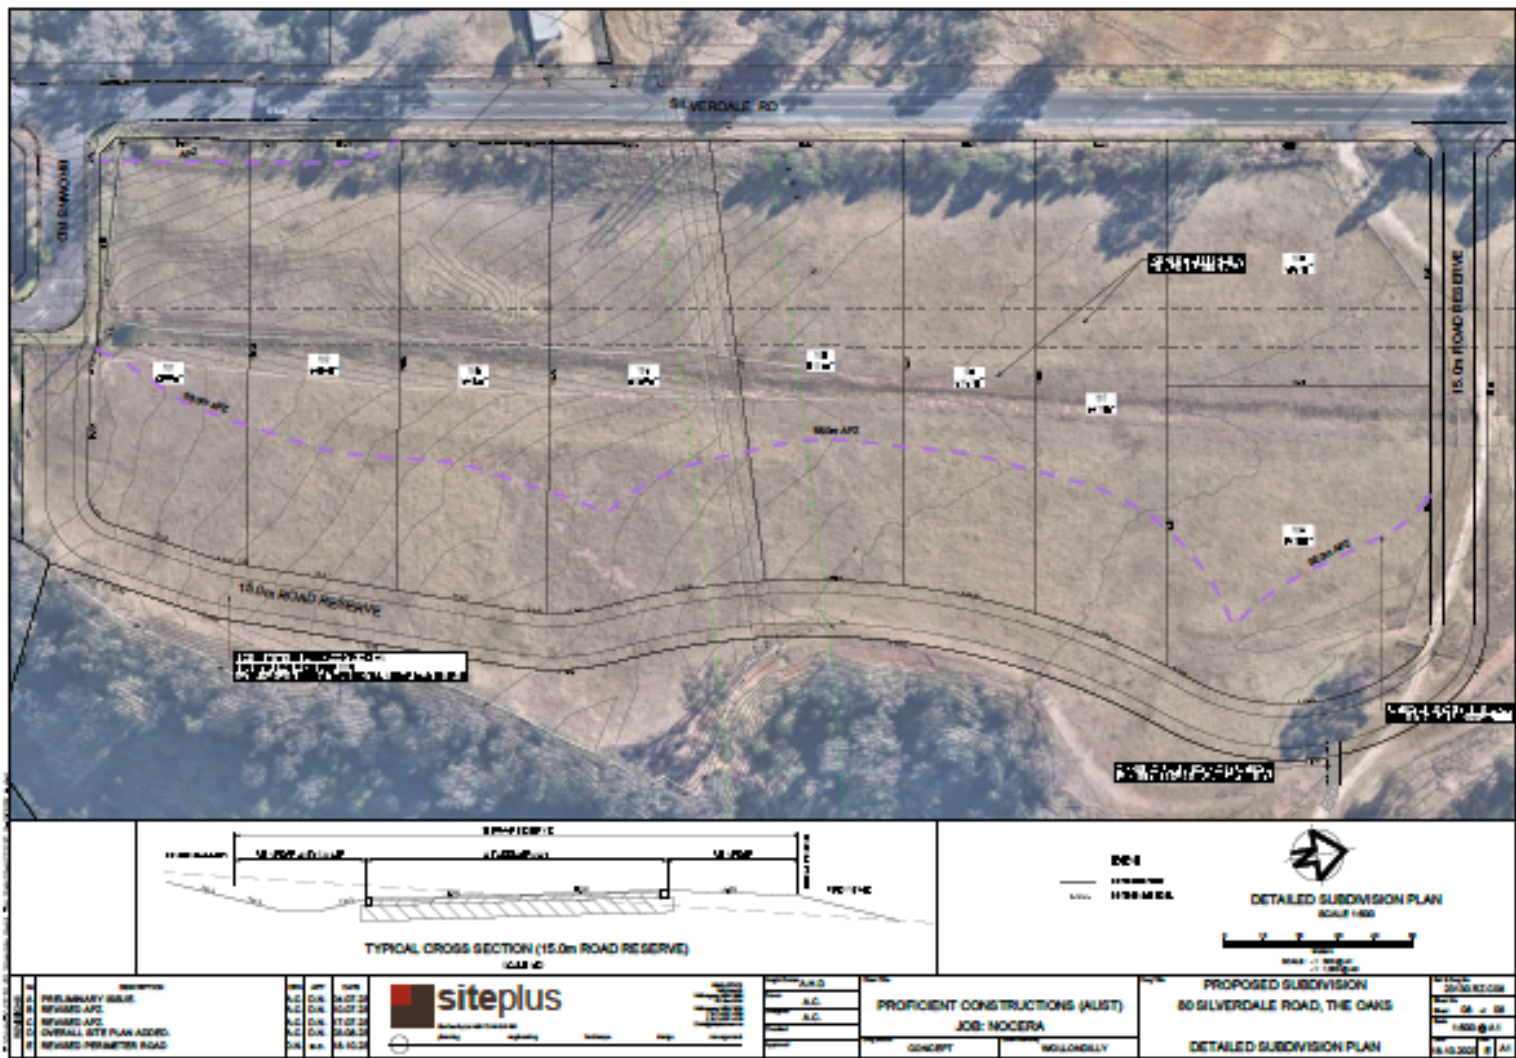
SitePlus Site Subdivision Plan 18/10/23
